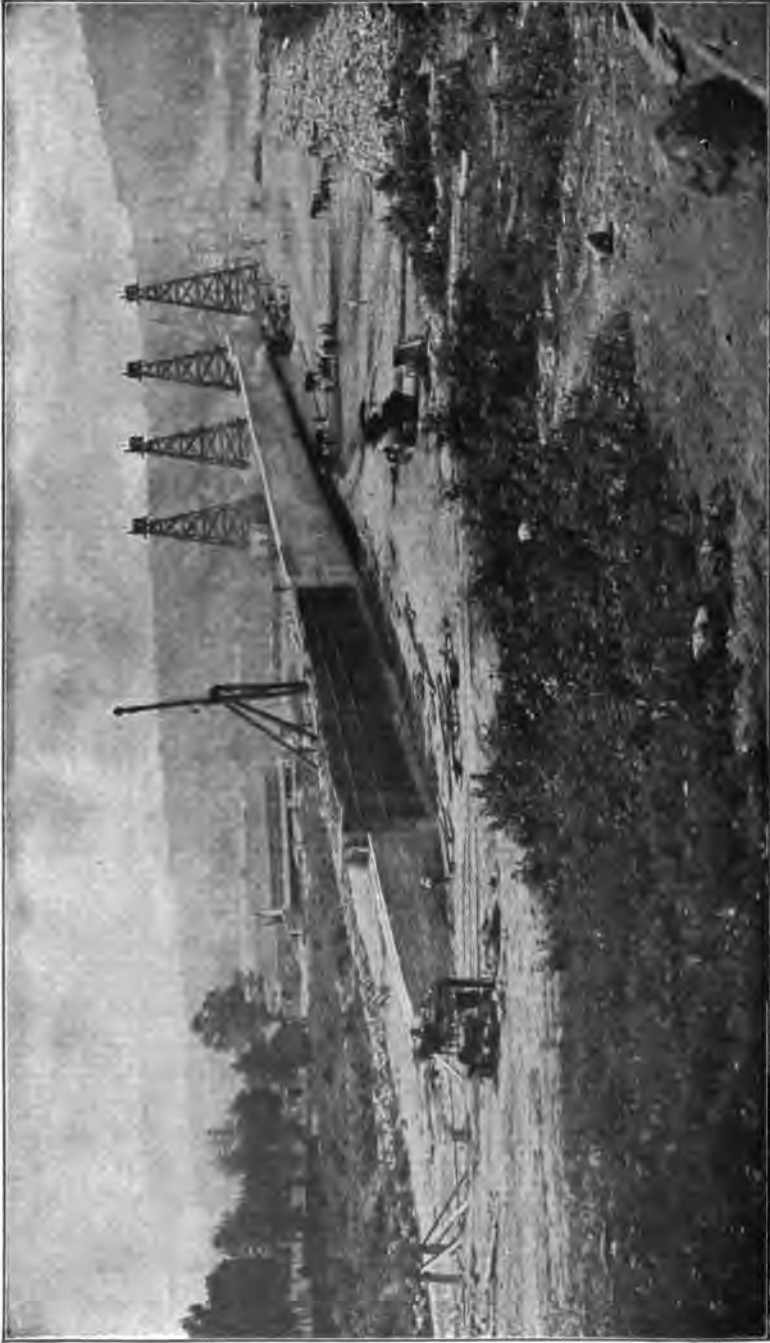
View of Construction of North Wing of Olive Bridge Dam, Showing Core Wall, Cableways, for Dam, Making of Embankment, etc.
